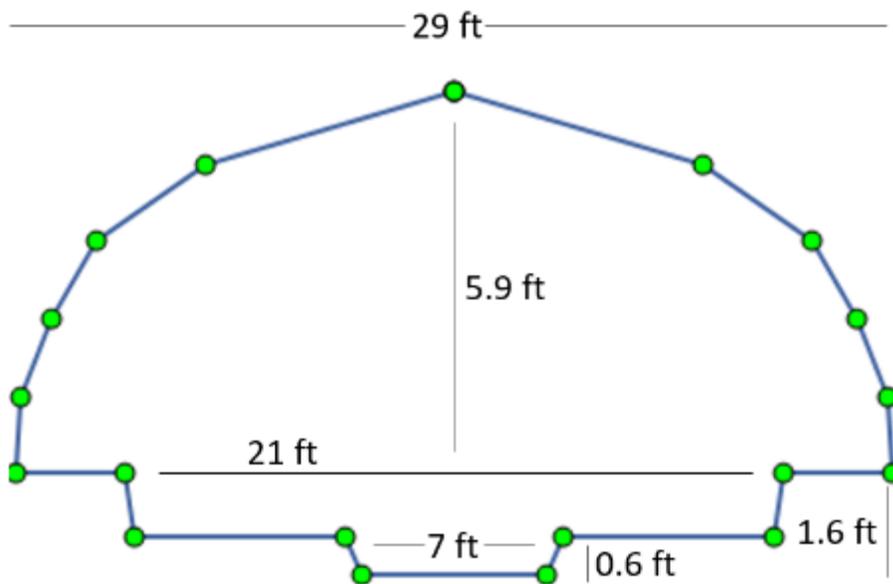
Culvert design and spacing for Alternative 4 SWMM model.
